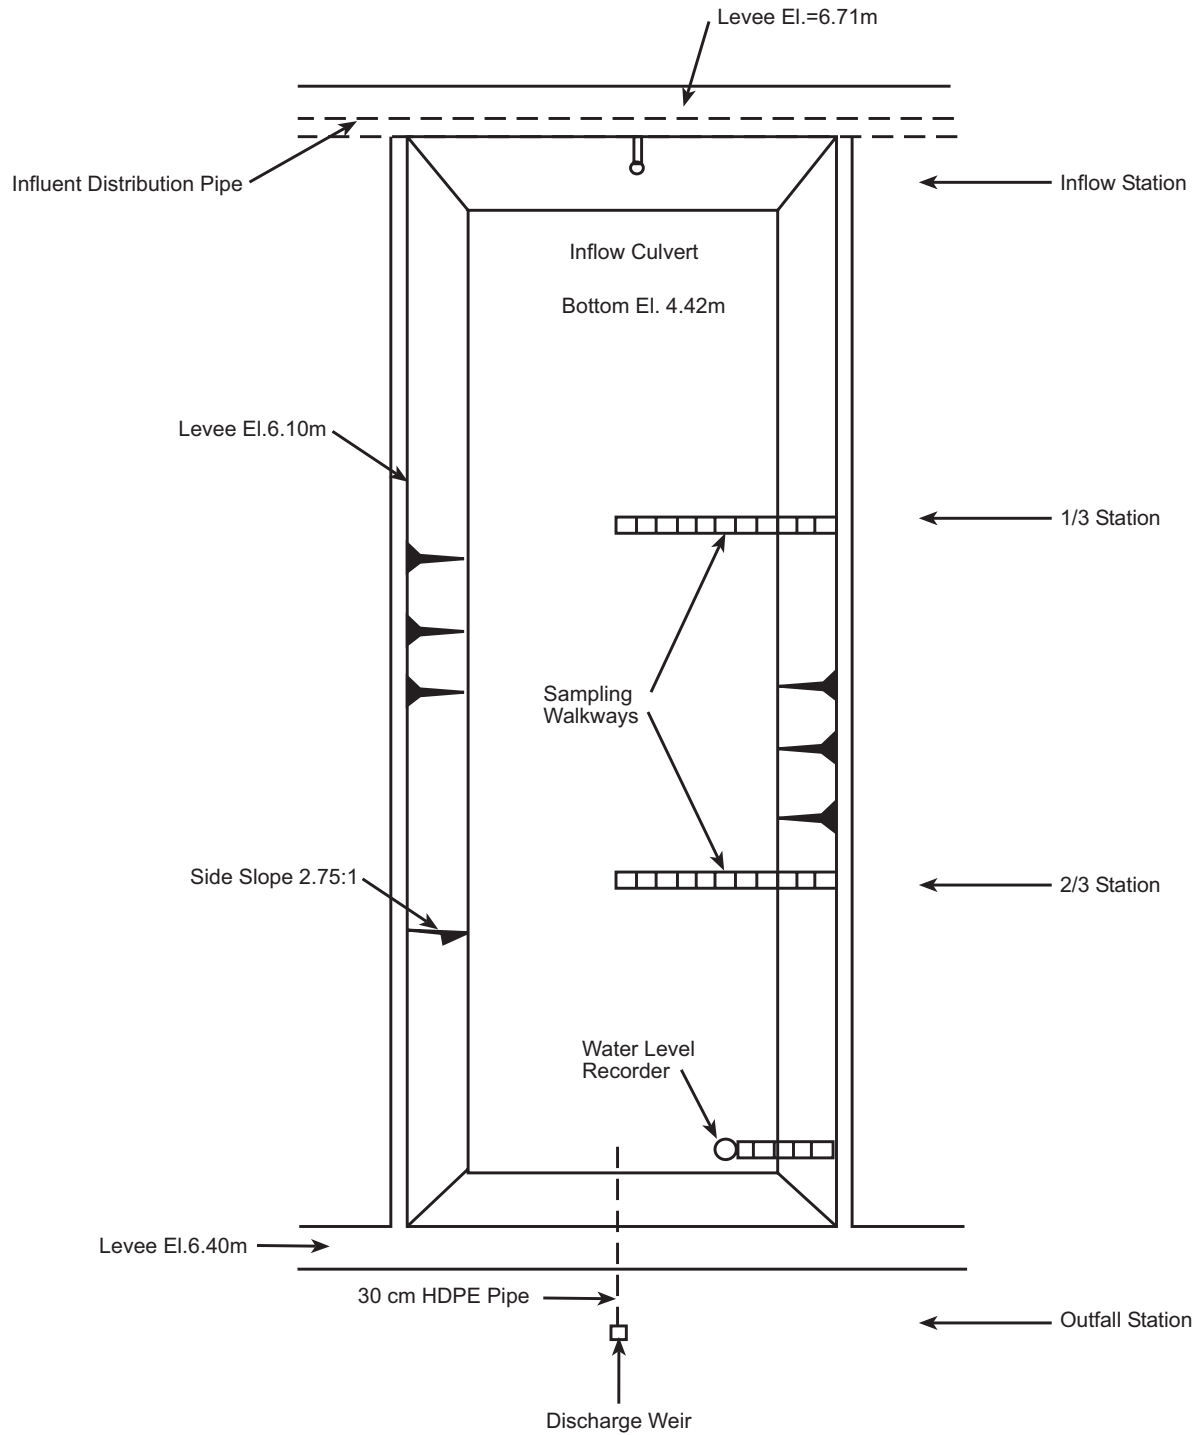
Plan View of Typical ENR PSTA Test Cell Showing Sampling Locations
